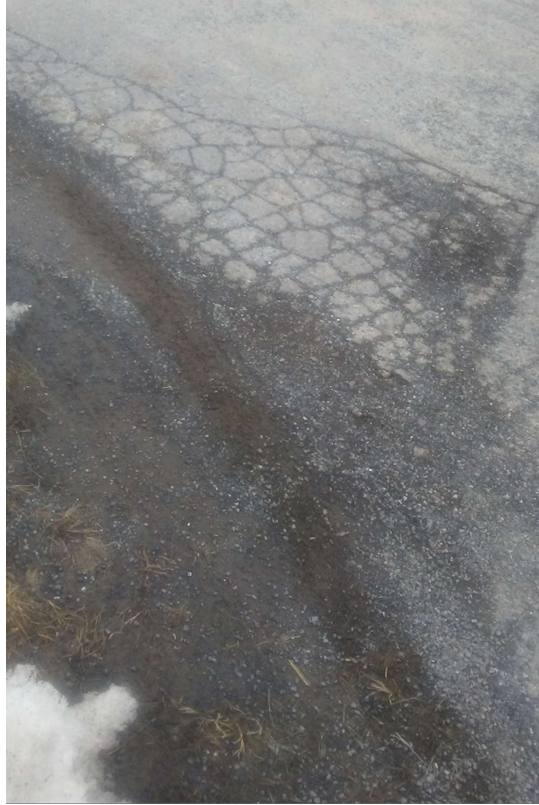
Pavement at the play area appears to have sunk, creating a tripping hazard with the connection to the sidewalk.
